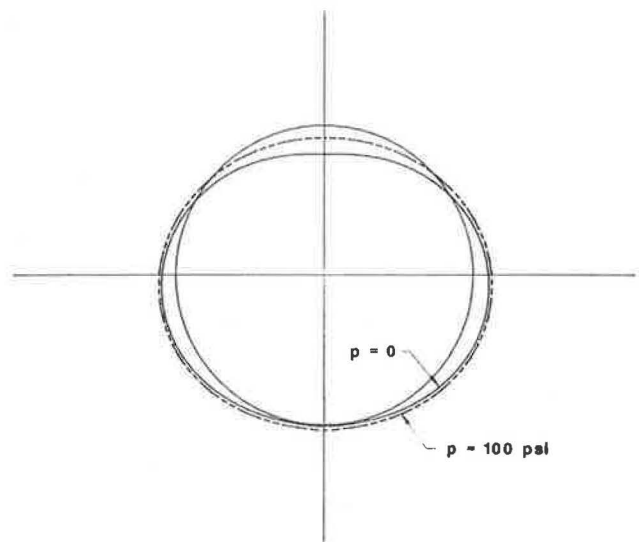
Deformed shape of a buried flexible pipe with proper haunch support and bedding before and after pressurization.
